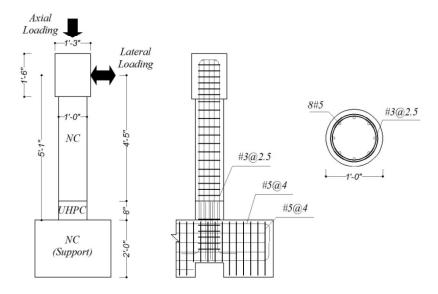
Specimen NS-2.5-10 (Non-Seismic detail) dimensions and reinforcement details (No stirrups at splice region).
